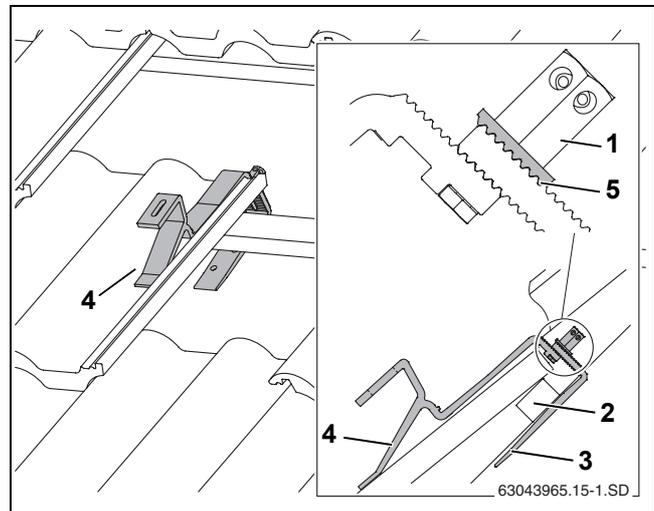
Fixed roof hook (for an improved view, some tiles have not been shown)
